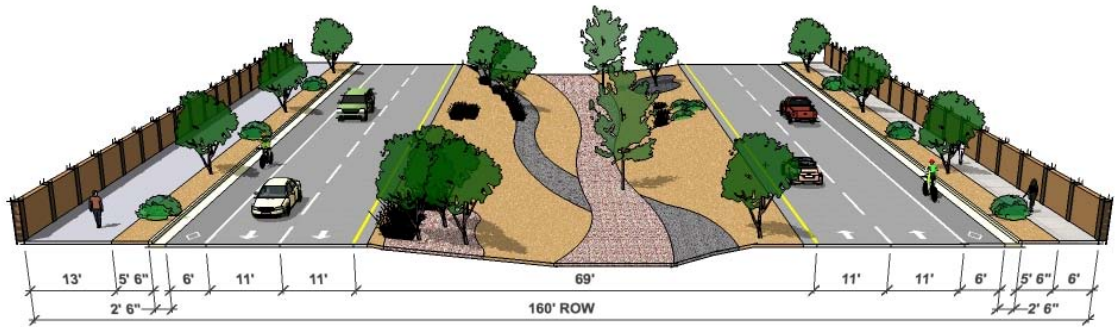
d: Southern Avenue Proposal (Elizabeth Street to Juan Tabo Boulevard)
